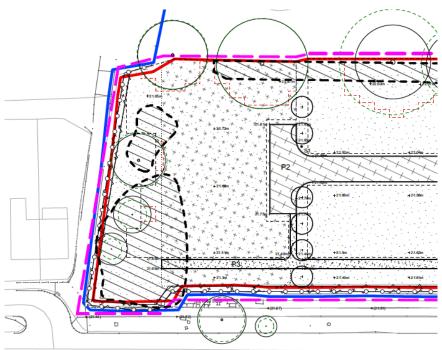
Approved layout under the original planning permission ref. no.17/03256/RE4
